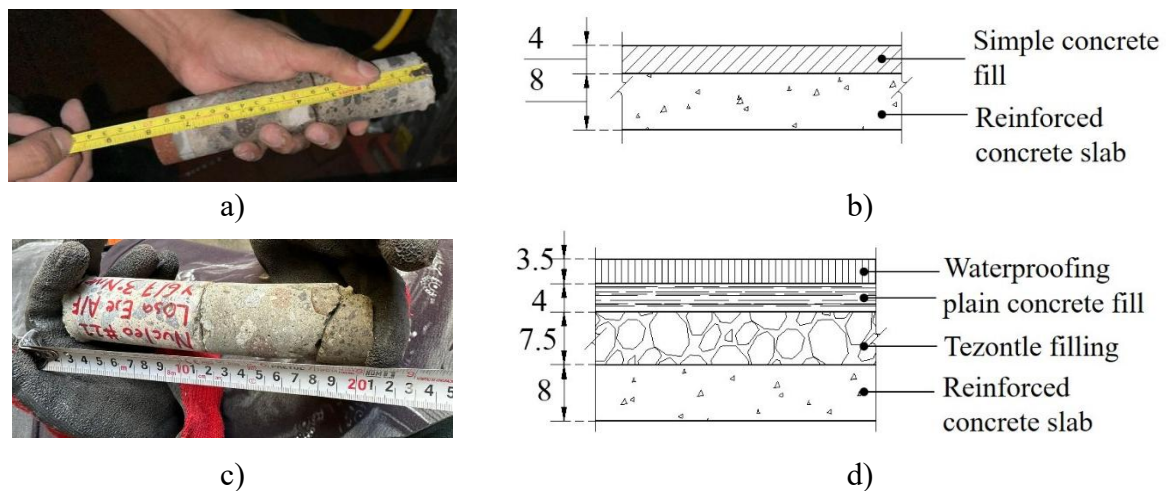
Construction system in floor and roof slabs; a) materials found in floor slab; b) thicknesses of materials in floor slab; c) materials found in roof slab; d) thicknesses of materials in roof slab. Units in cm.
